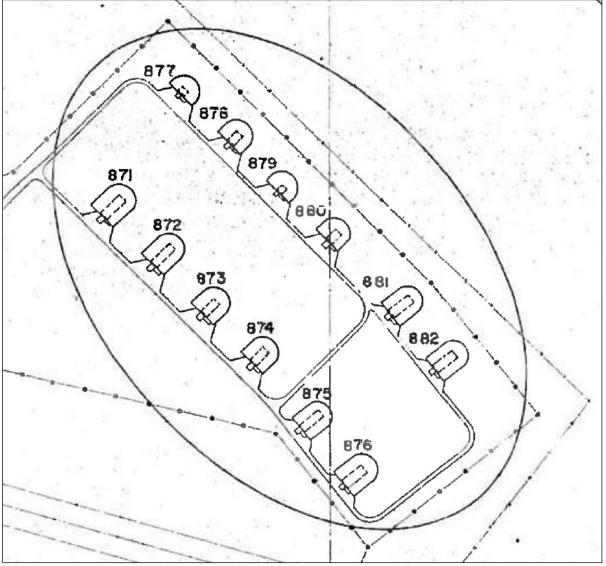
Original plans showing the layout and orientation of the 12 ECM structures.
